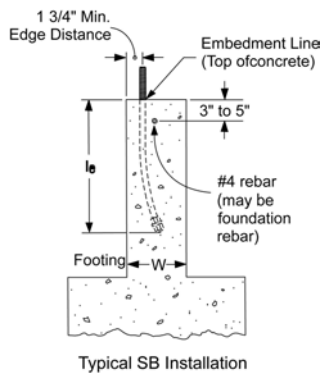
SB ANCHOR BOLT—TYPICAL INSTALLATION
